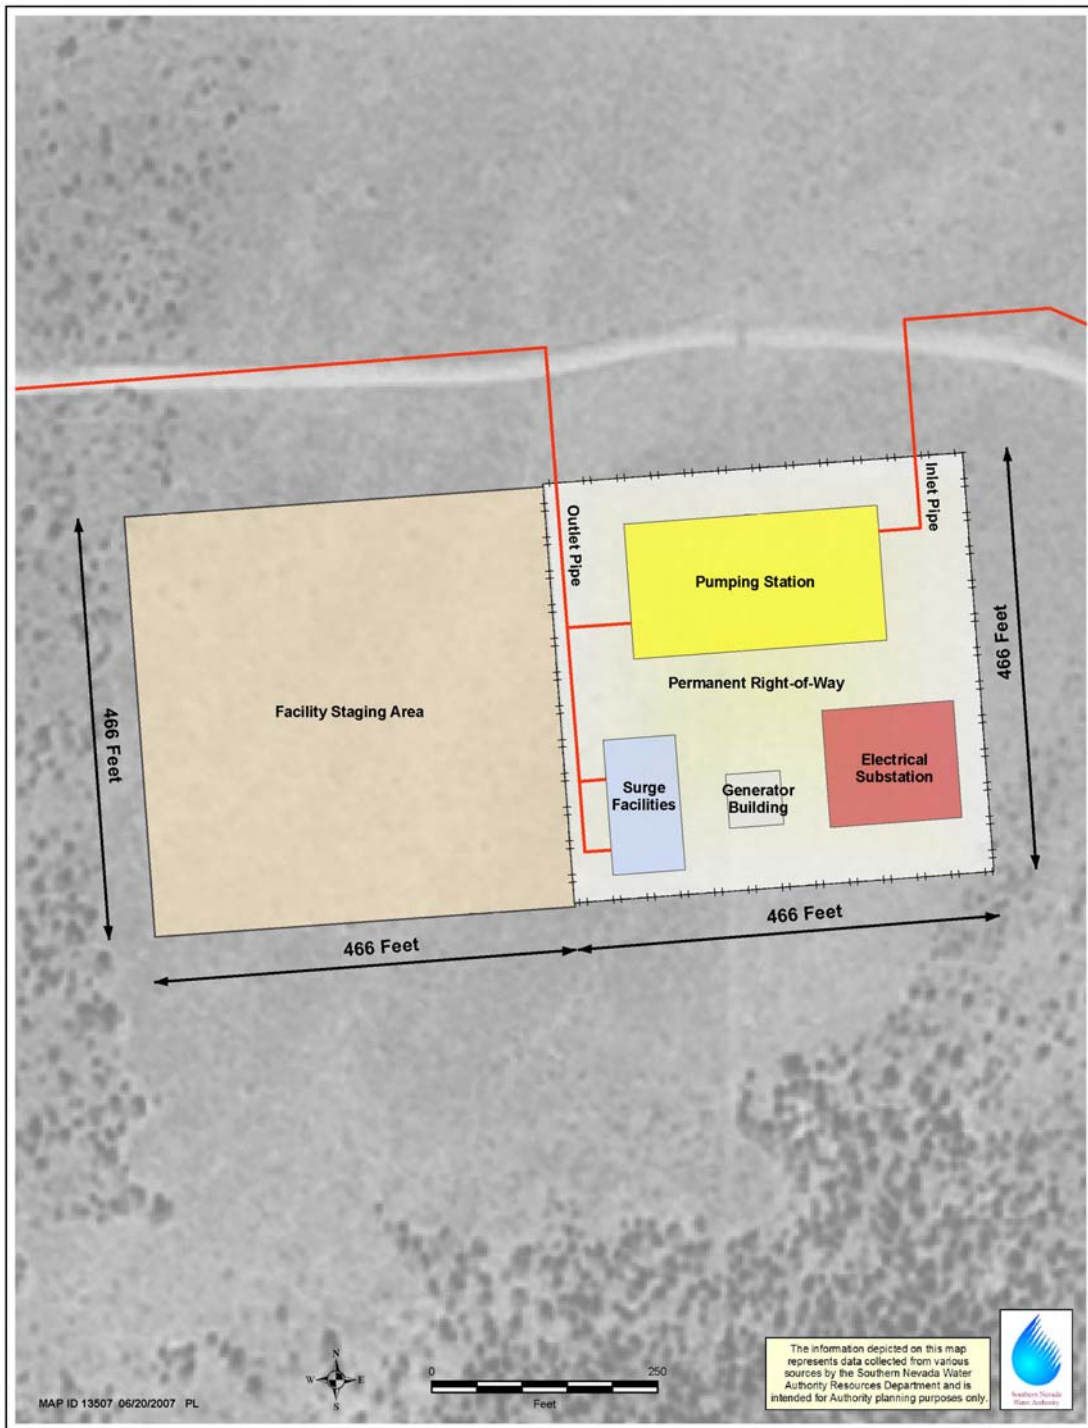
Preliminary Lake Valley Pumping Station Site Plan
